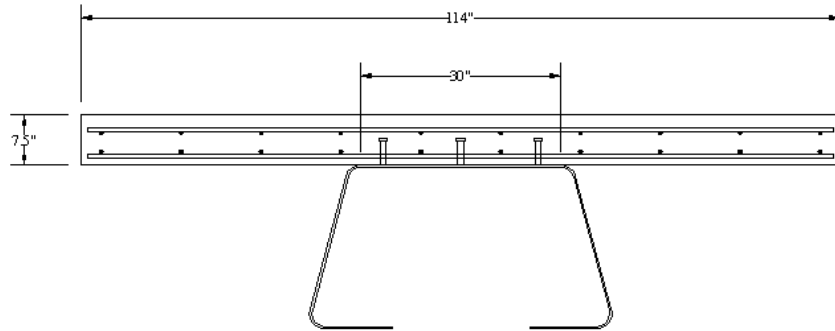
COMPOSITE SPECIMENT CROSS SECTION
